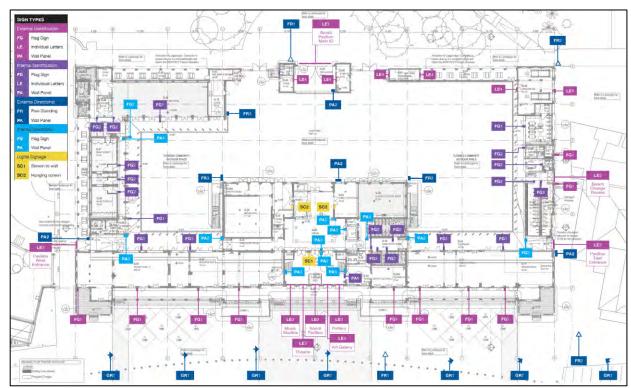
Extract of ground floor level plan demonstrating location of proposed signage discussed in detail below.
